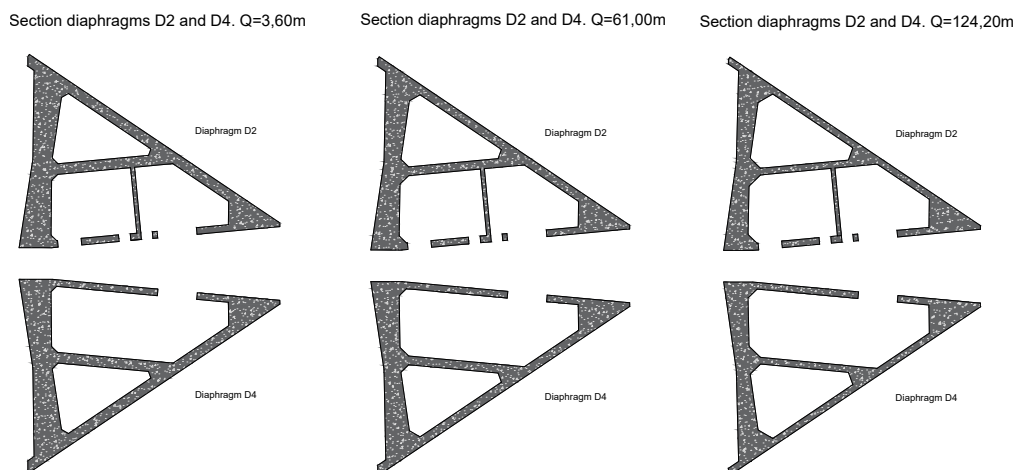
Transversal sections of the right triangular elements. From Drawing 5.
